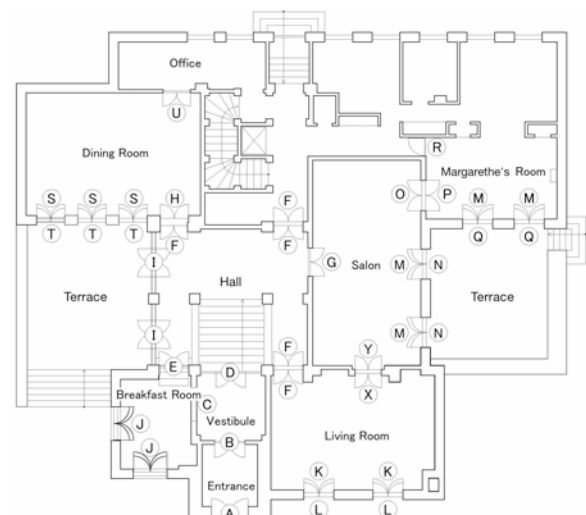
Layout view of all the doors that have been installed in the Hall. The Doors role to connect the room and the rooms and are elements while at the same time create the spatial structure of the symmetry of the interior of each room. Arrangements of the single door and double doors, placement of double doors as well as the direction in which they open are illustrated. Since the wall that separated the Salon and the Living Room was demolished during the renovation. Therefore, the dimensions for "X" and "Y" are taken from prior plans of the house.
